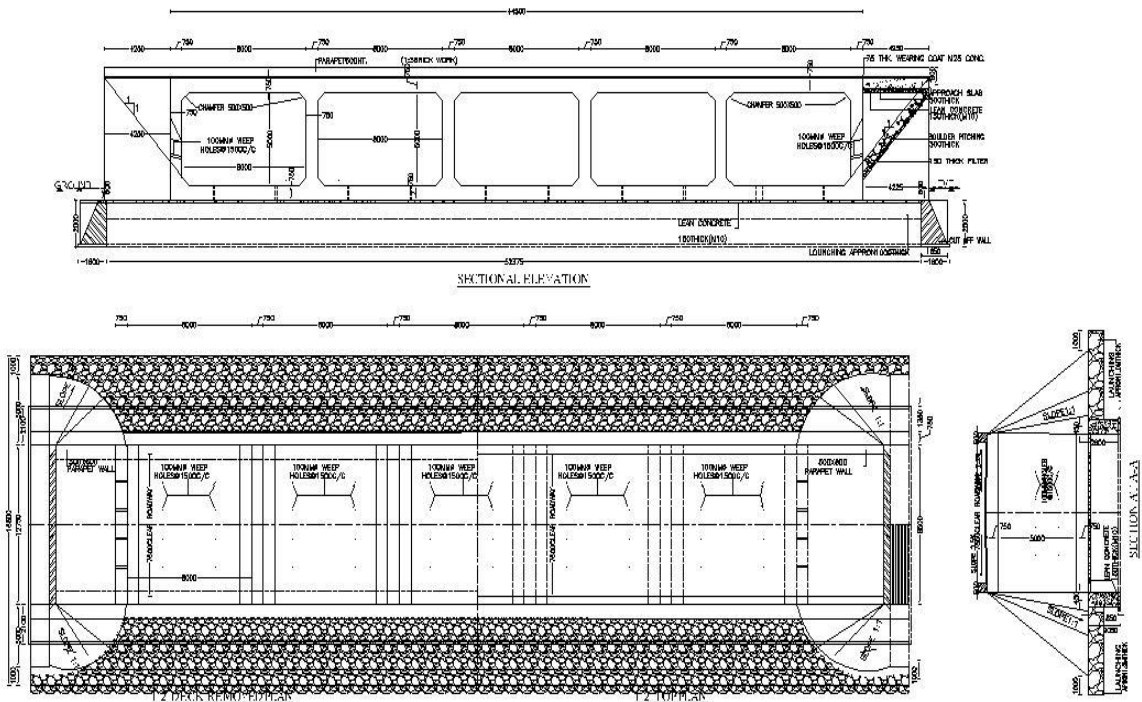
Half top and Half bottom elevation & plan of Box type Bridge
